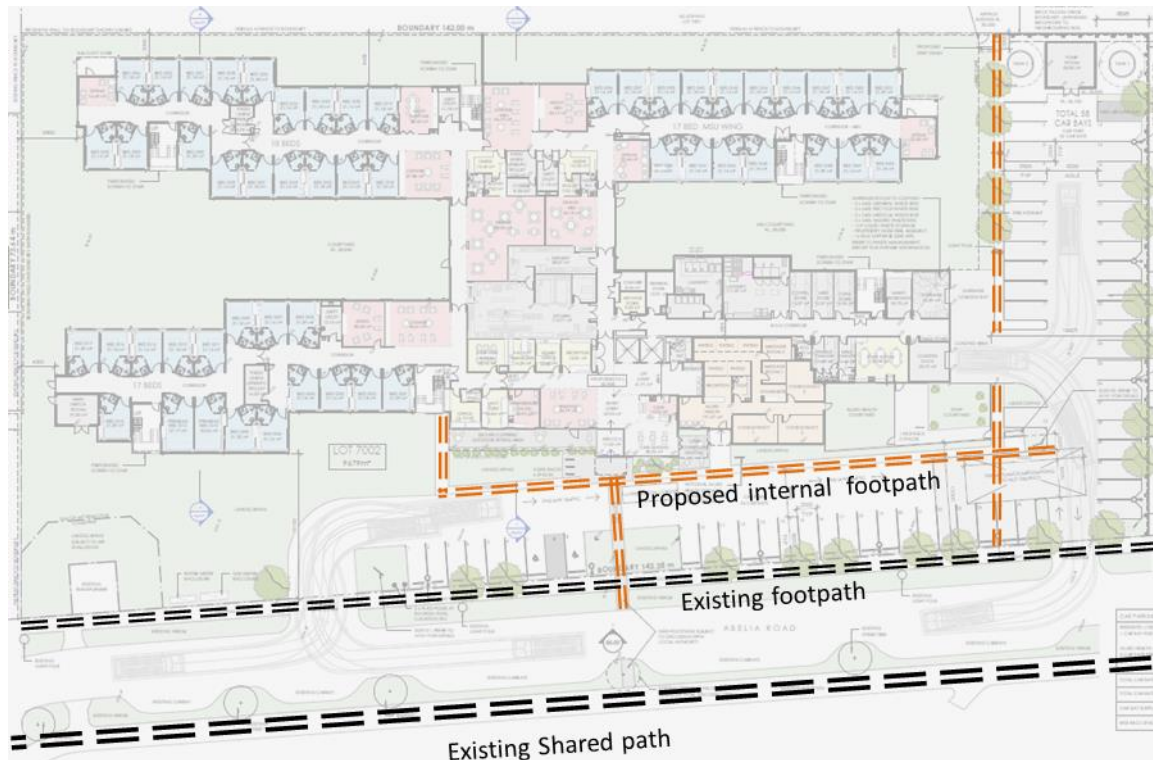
Proposed development internal footpath and its connectivity to the existing abutting footpath network
